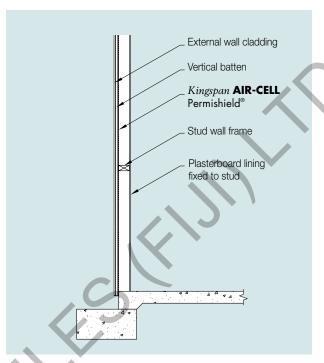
Side elevation of Kingspan AIR-CELL Permishield® on timber-framed wall
